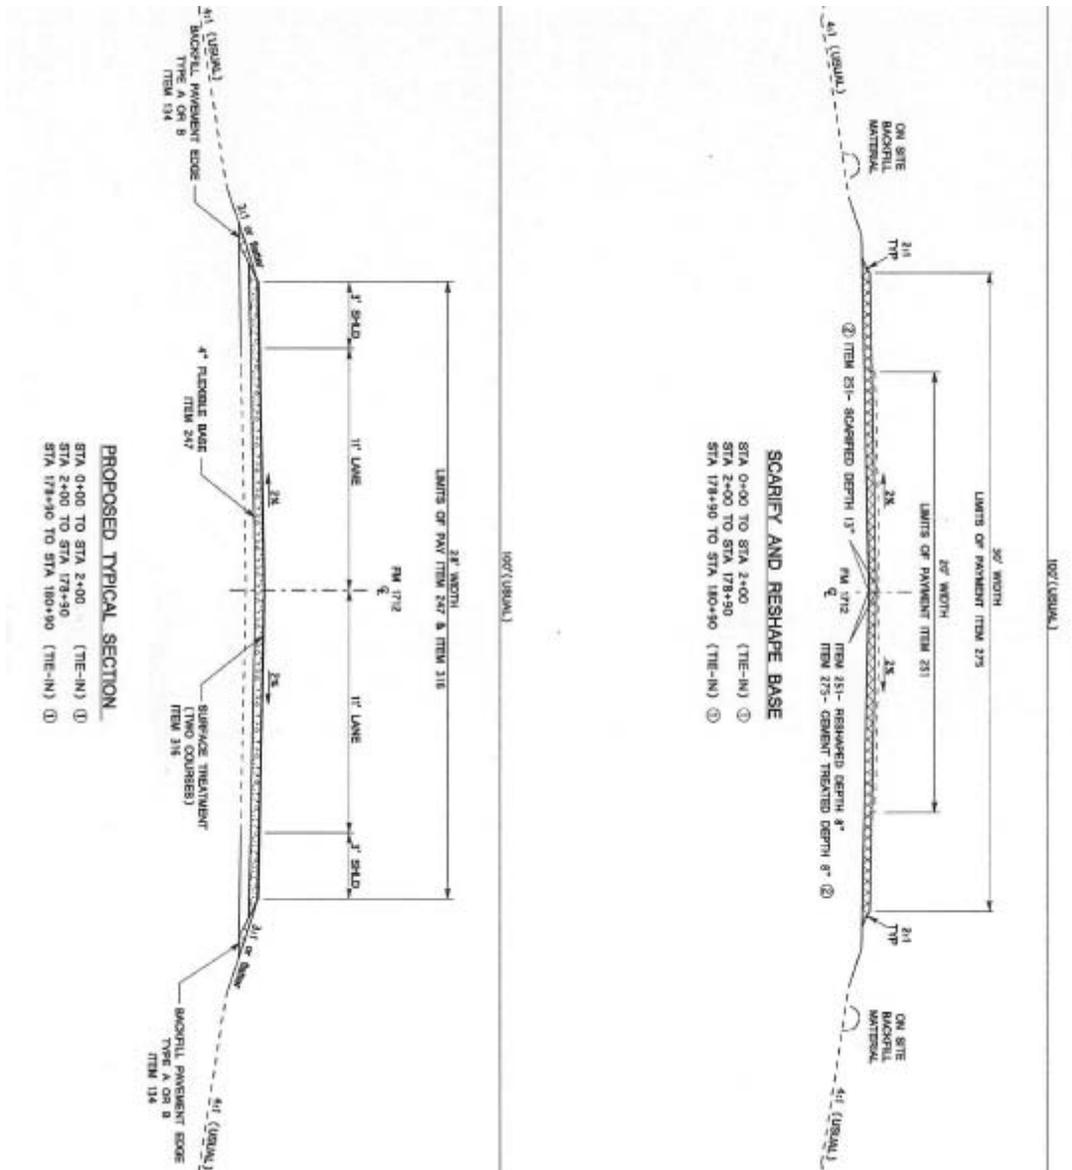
Existing and Proposed Sections for FM 1712 (Cont.).
